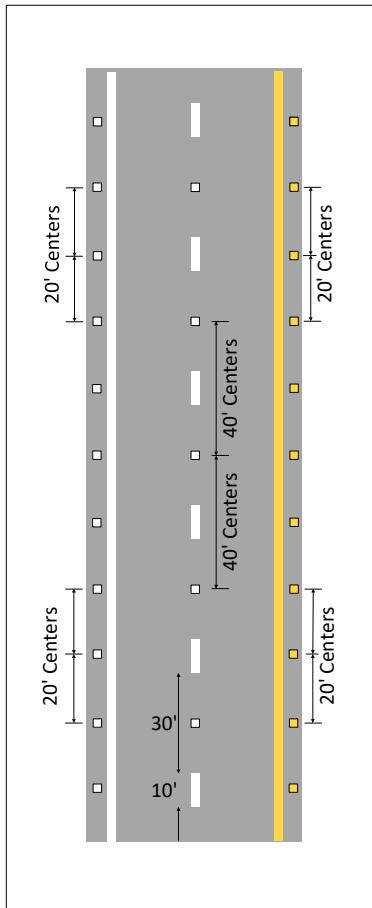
Proposed Enhanced Pavement Markings for I-10 Frontage Roads over Adams Bayou.
